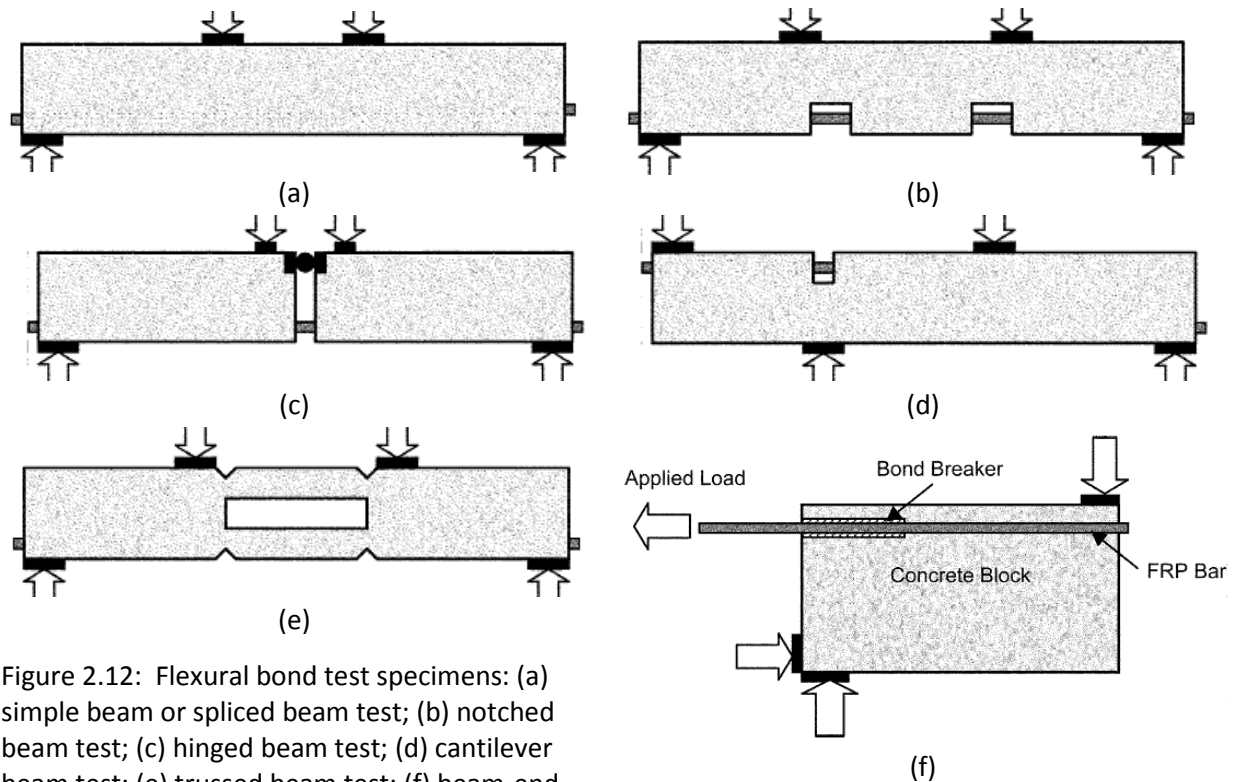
Flexural bond test specimens: (a) simple beam or spliced beam test; (b) notched beam test; (c) hinged beam test; (d) cantilever beam test; (e) trussed beam test; (f) beam-end test. (Source: ACI 440R-07)
